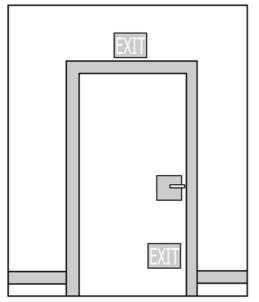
Floor Proximity Exit Sign Mounted on Non-fire Rated Exit Door
